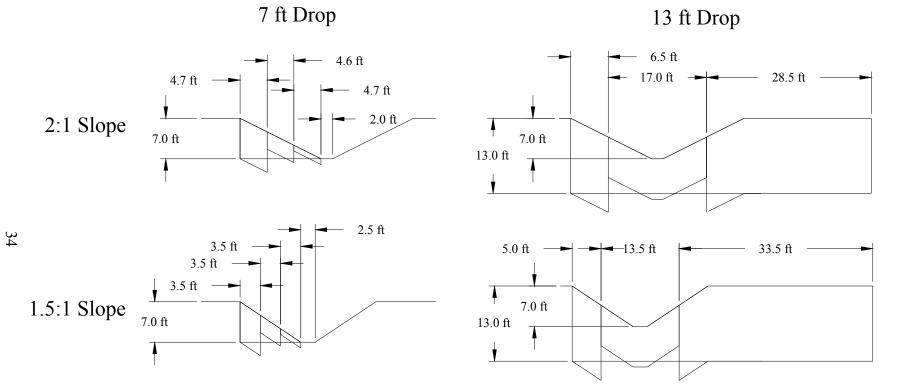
Cross-Sectional Ditch Modeling Dimensions and Drop-Off Heights
